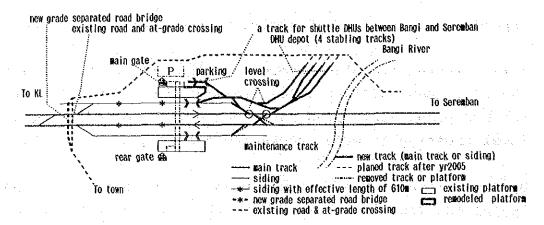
Alternative Track Layout Plan of Bangi Station in RBCS
